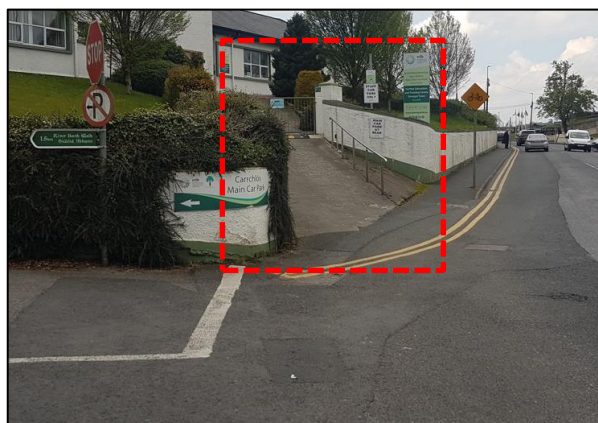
Proposed Footpath Alignment and location of Existing Culvert (Dwg. No. 11199-4-006)
